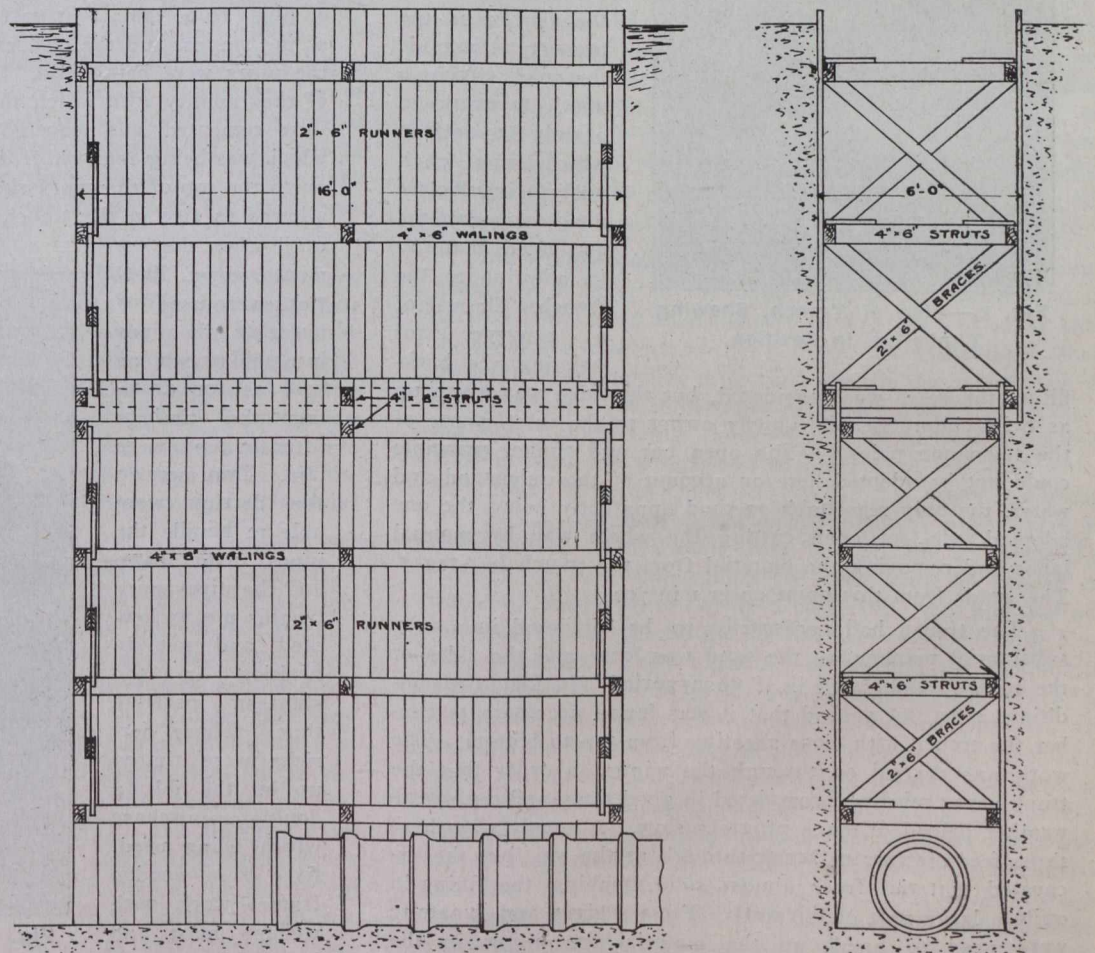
Plan Showing Cross Sectional Views of a Top and Bottom Setting of Timber.
